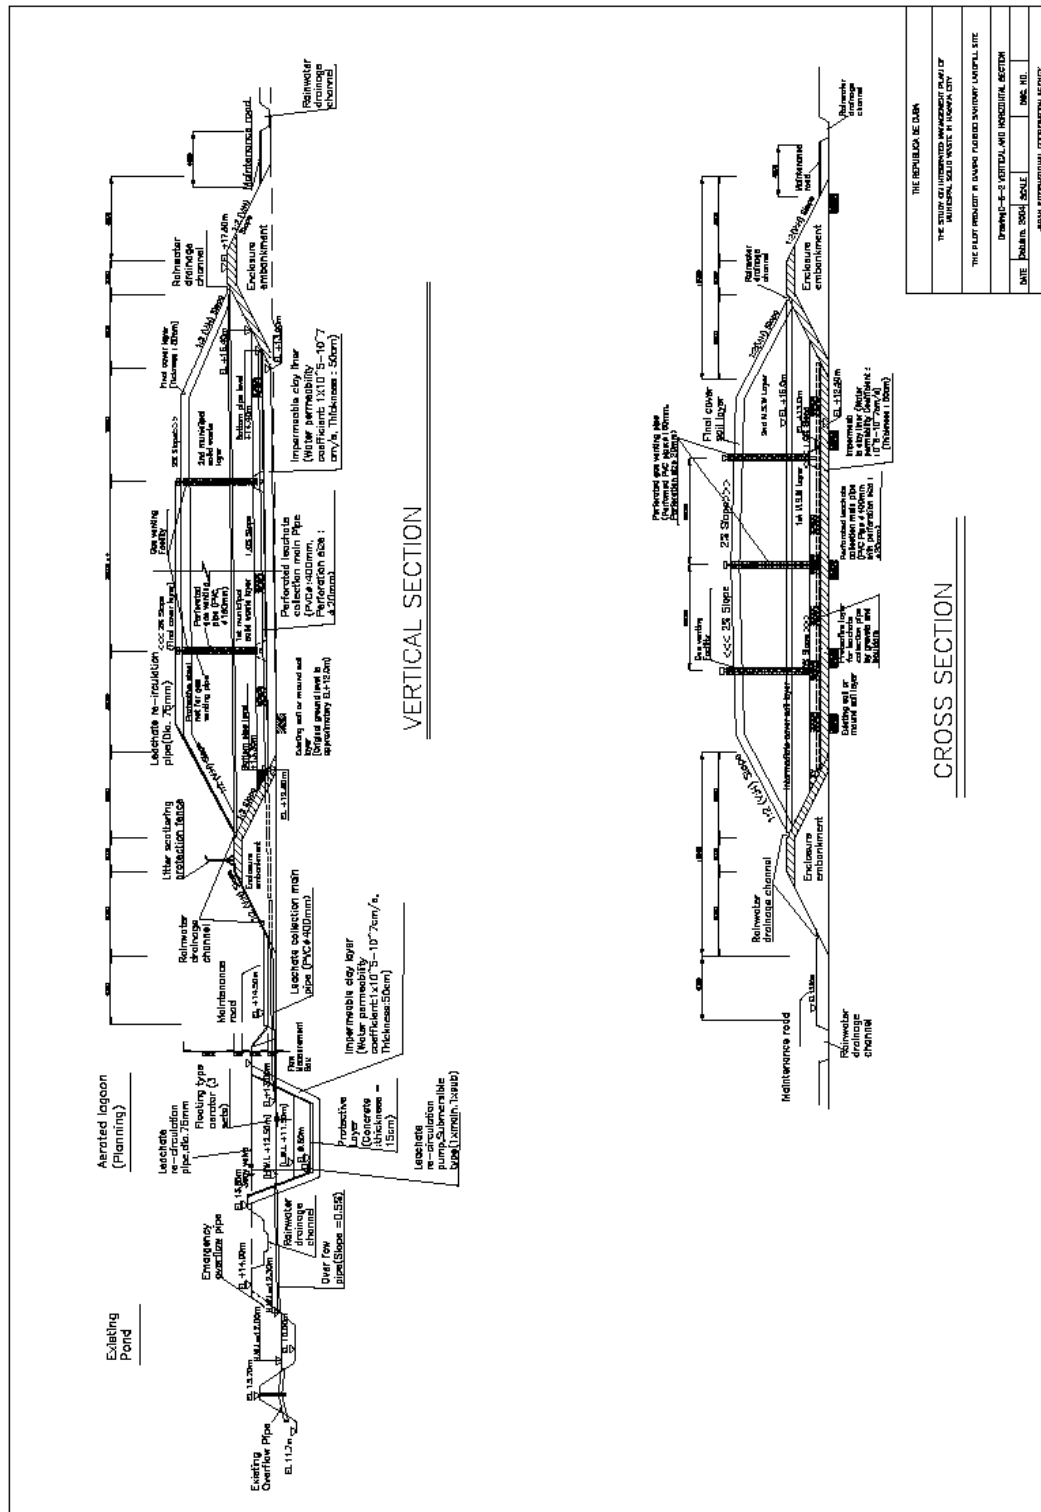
Section of Pilot Project in Campo Florida Landfill Site
